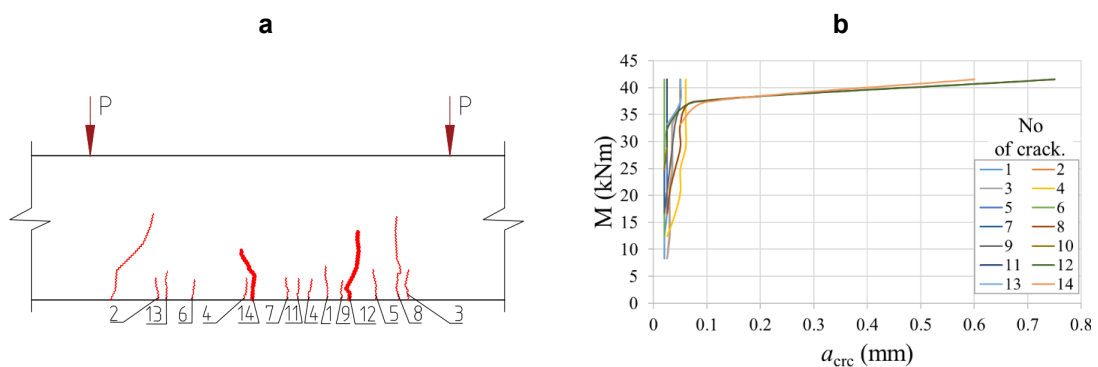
Crack pattern (a) and crack opening diagram (b) for beam SF2-250.
